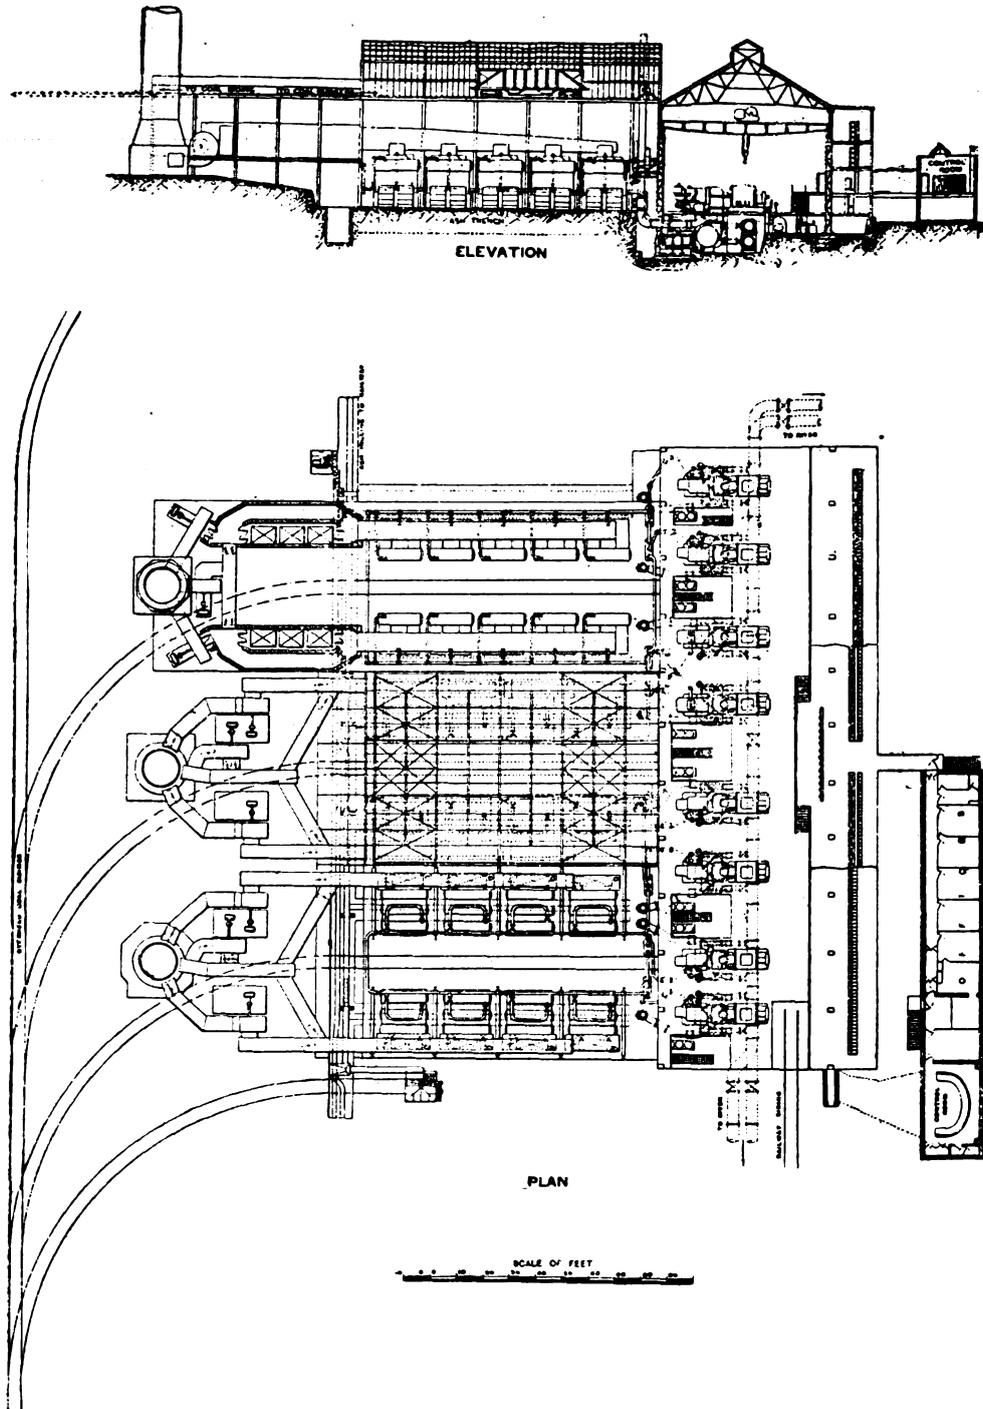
PLAN AND ELEVATION OF CARVILLE POWER STATION.
